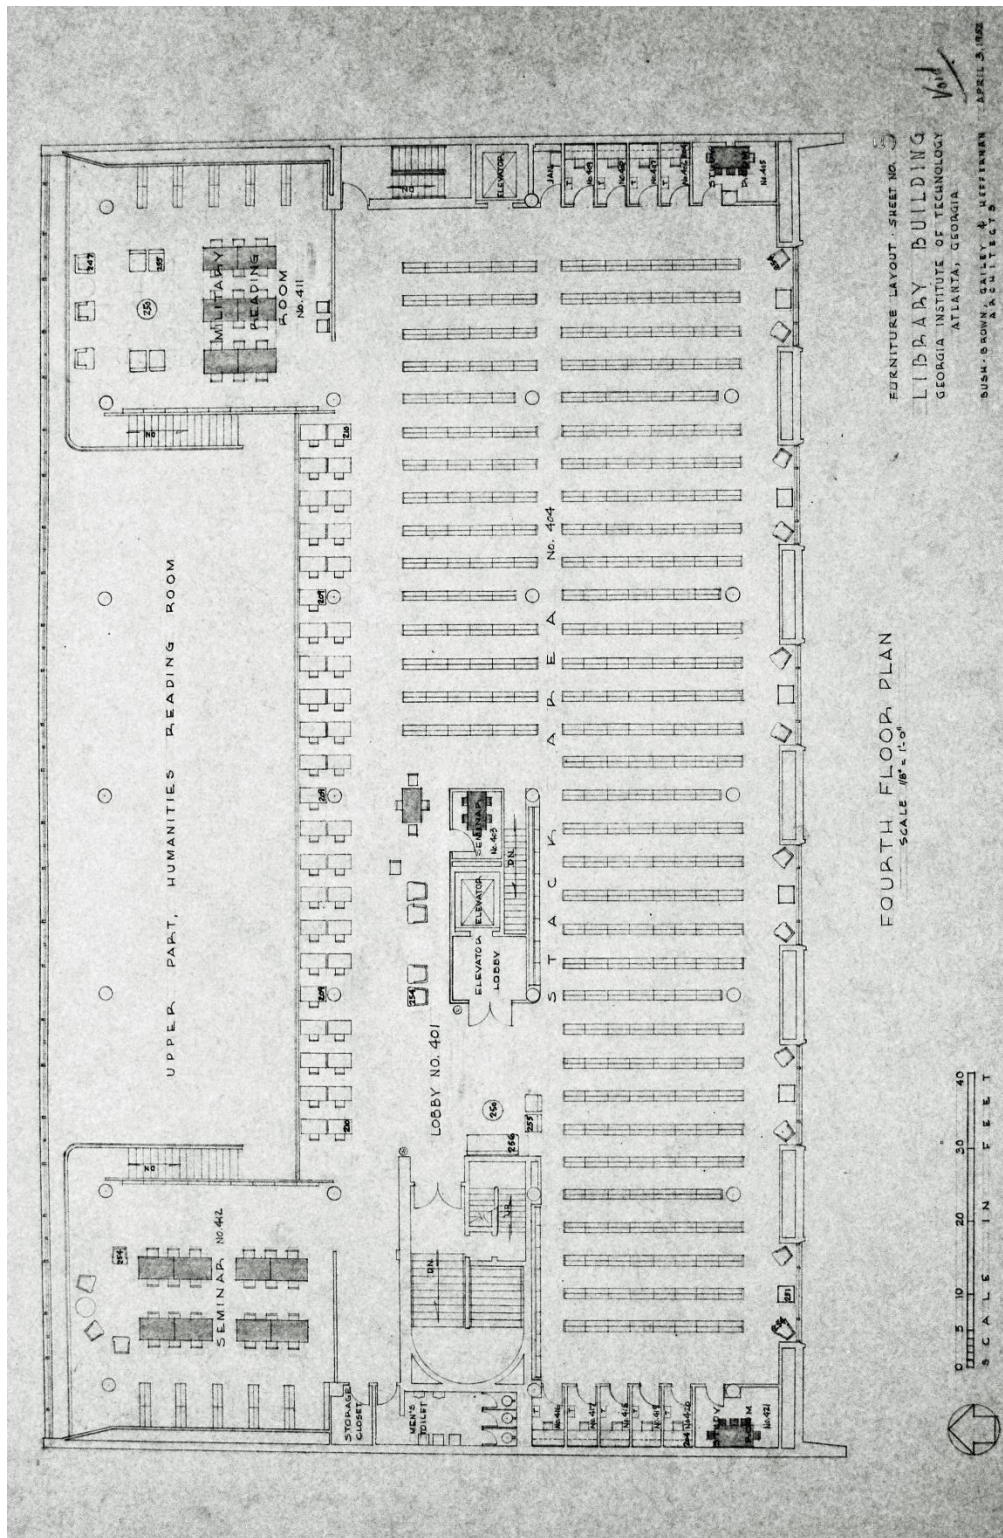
Original fourth floor plan and furniture layout. *Georgia Tech Institutional Drawings Collection, DV005, Series 3: Judge S. Price Gilbert Memorial Library/Dorothy M. Crosland Tower, 1923-1980 and undated, Drawer L2, Folder 3.
